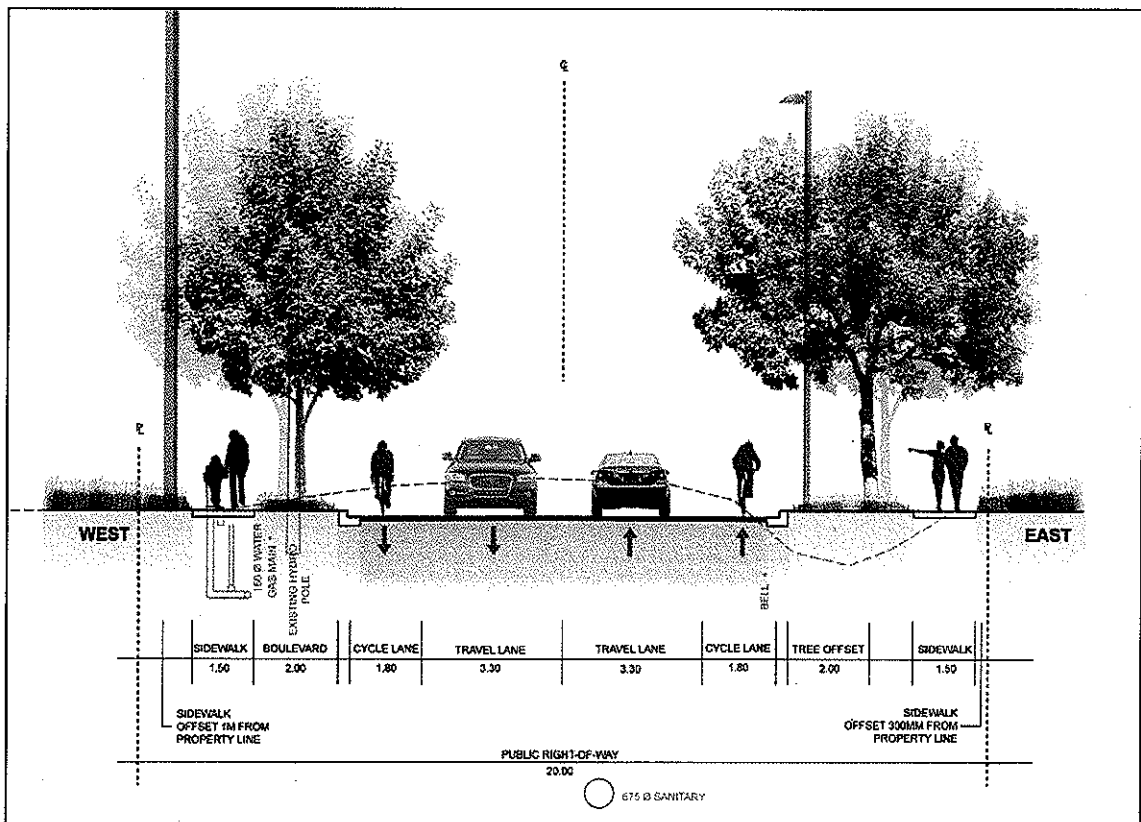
Recommended Typical Cross-Section for 6th Concession Road Preferred Alternative
